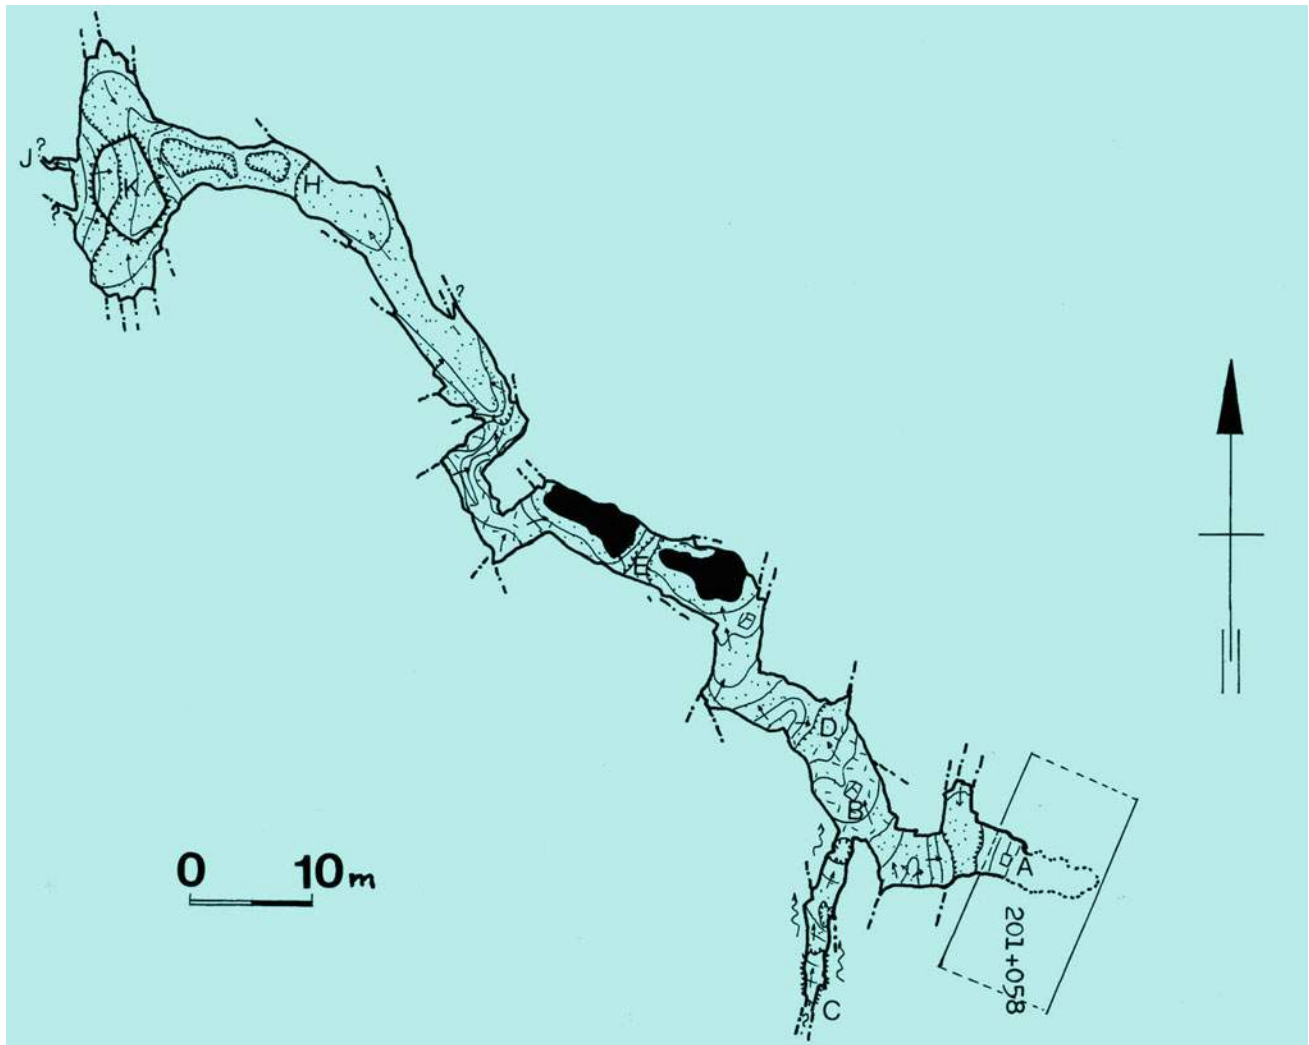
Plan of cavern at km 201 + 058 in Sveti Rok Tunnel
